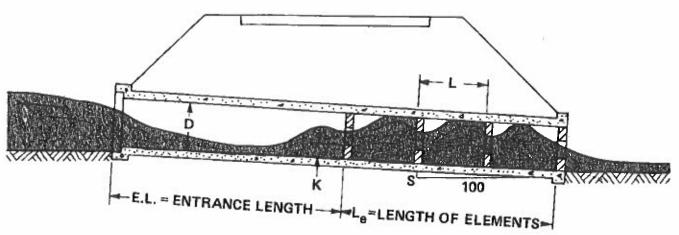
TUMBLING FLOW IN PIPE CULVERT.
